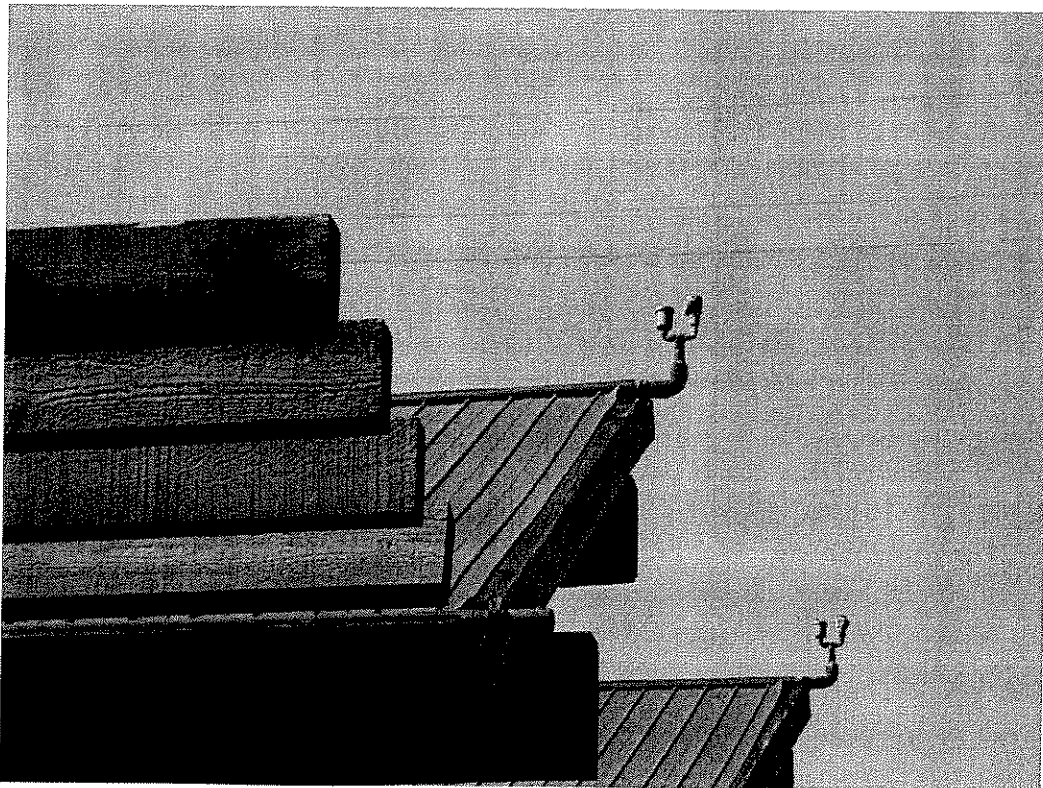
Close-up of Vacuum Relief and Air Eliminator Valves.
